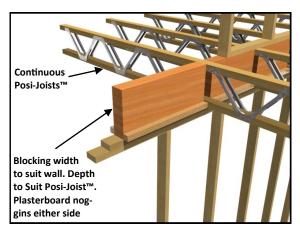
Continuous Posi-Joists™ Perpendicular to Internal Load Bearing Wall
